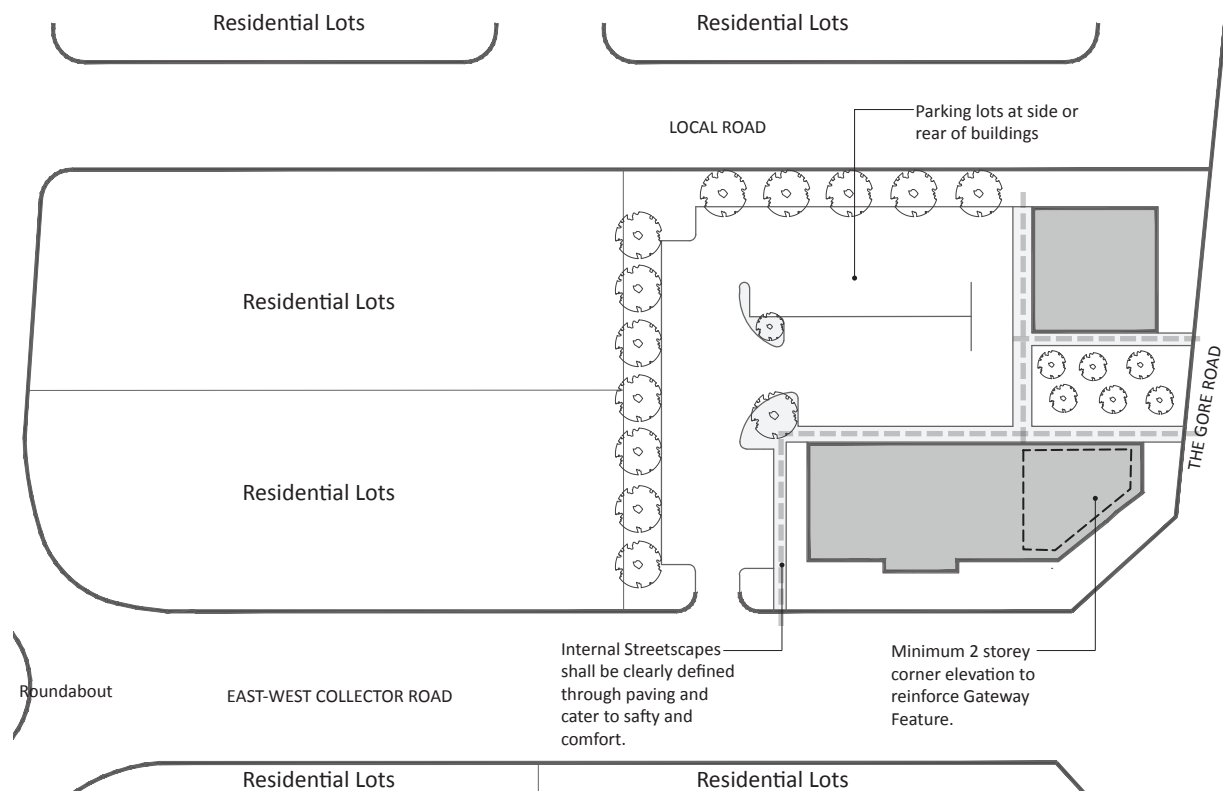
Conceptual Design of Convenience Retail Site
